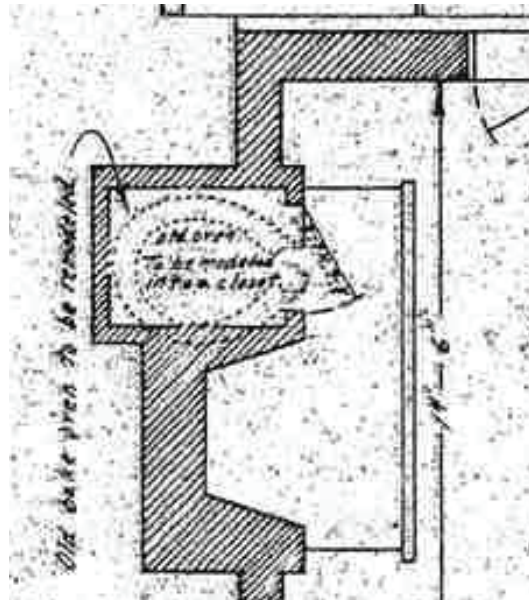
Close-up of brick oven on Kitchen floor plan from 1922 "Repairs & Improvements."
